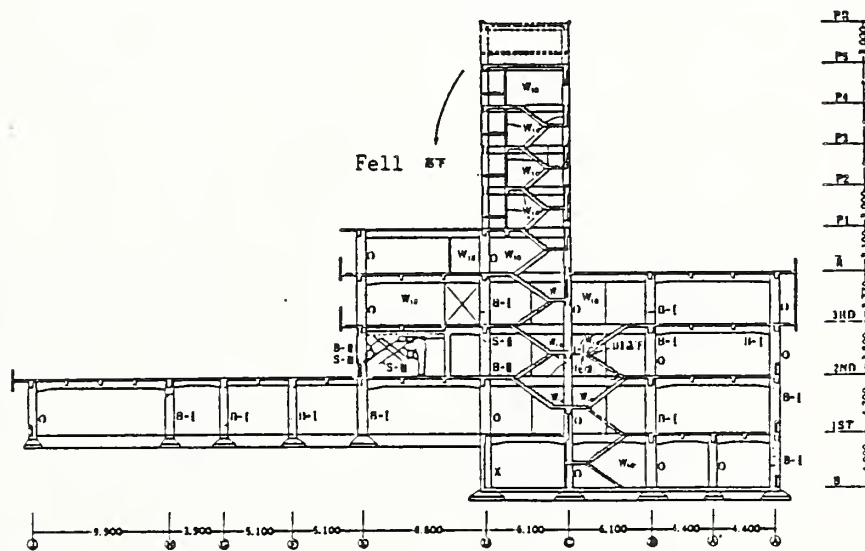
Section of 4th-Frame of Old City Office and the Damage of Columns in 1968 (Ref.4)
